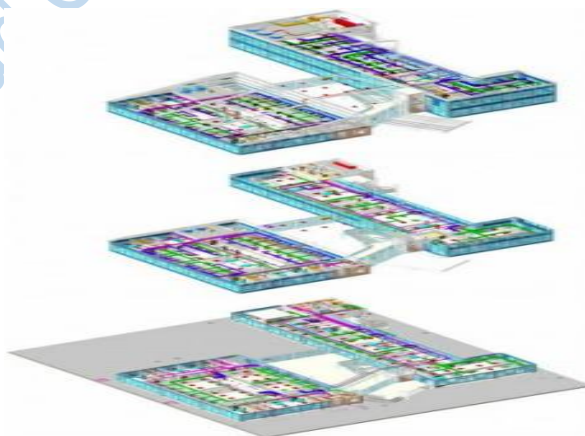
3D Building Plan of Kishmar University Administrative Building (Google Search)
